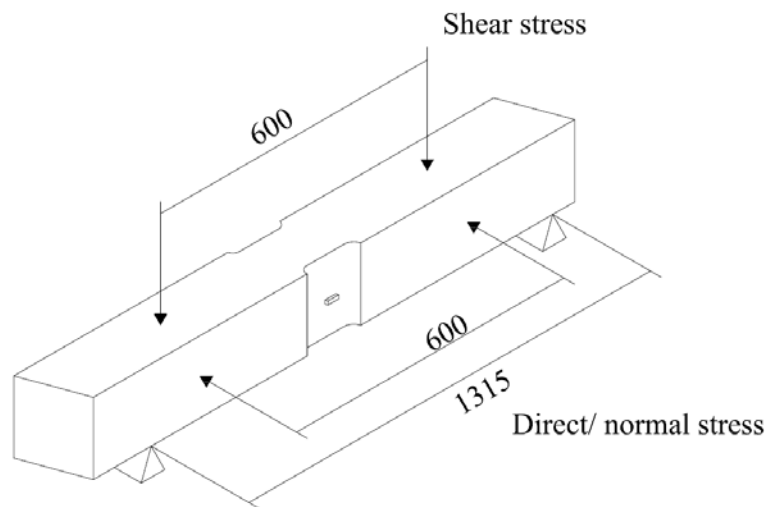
The loading of the specimen, dimensions in millimetres.
